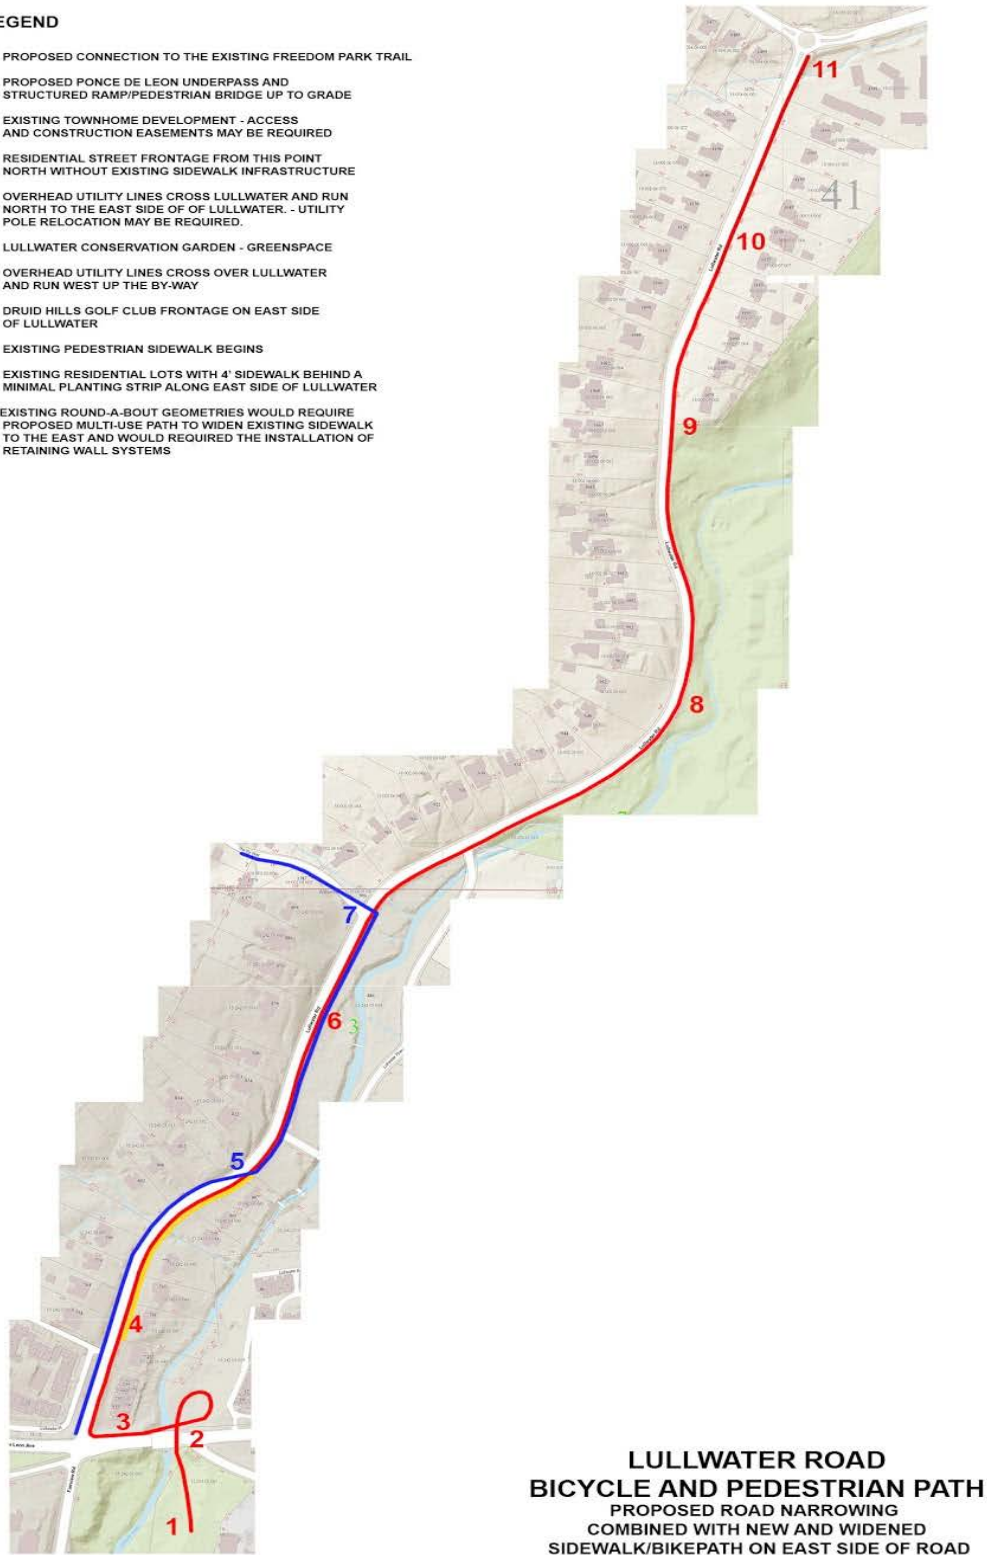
Lullwater Road Bicycle and Pedestrian Path - Proposed Routing
